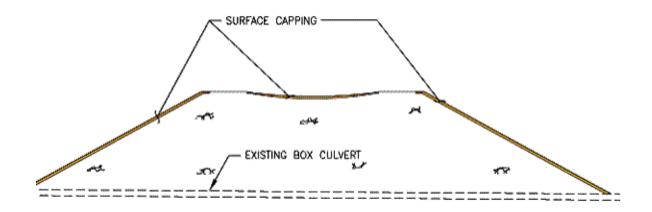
Covering of contaminated rock to keep water and oxygen from infiltrating
